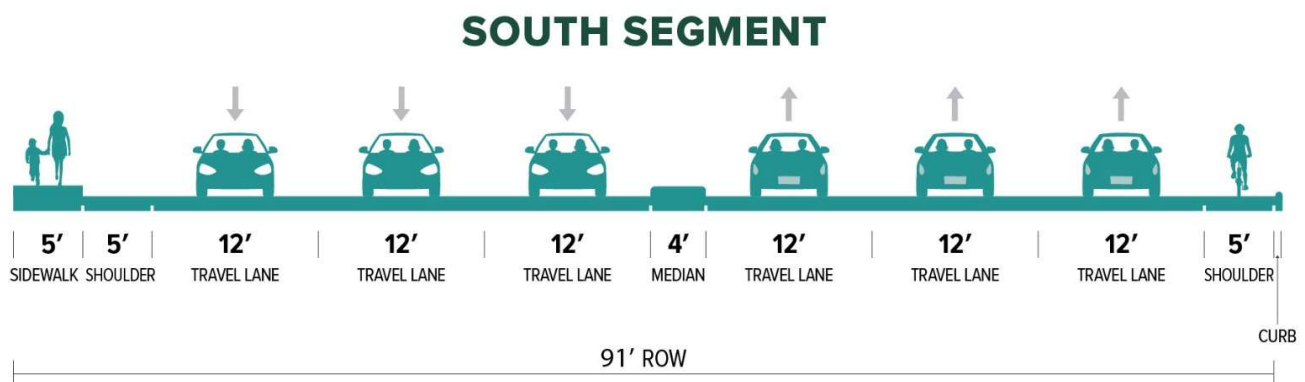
South Segment: Howe Avenue - La Riviera Access Road to Power Inn Station
